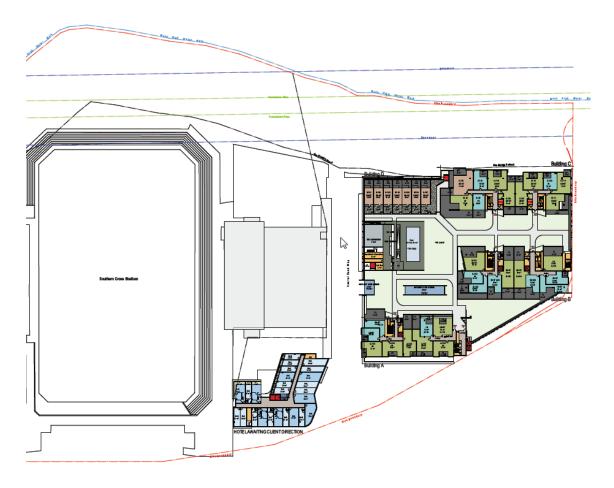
Woolooware Bay Town Centre, Stage 4 Residential/Hotel project
